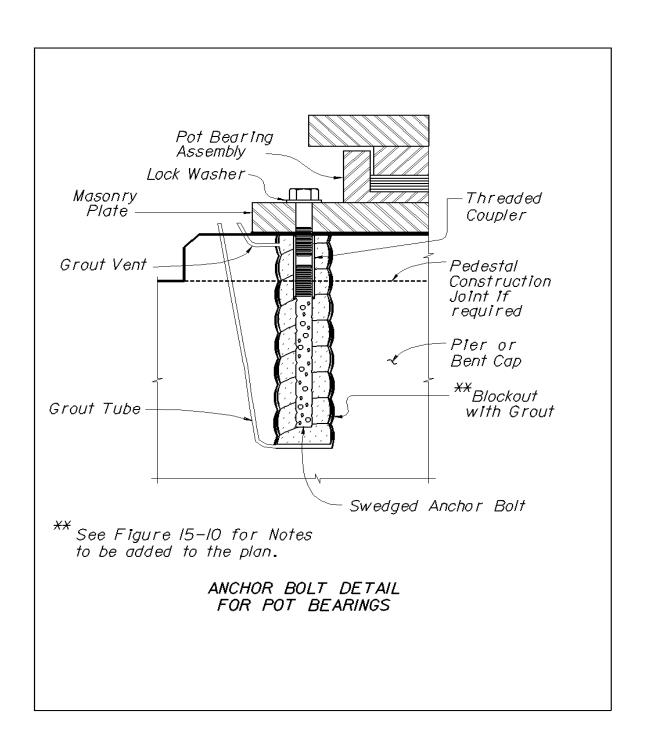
Anchor Bolt Detail for Pot Bearings
